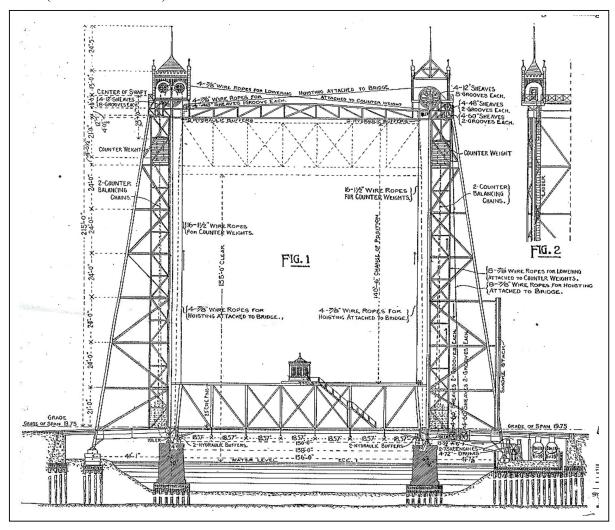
Halsted Street Bridge, Chicago, IL (Engineering Record, March 4, 1893)
